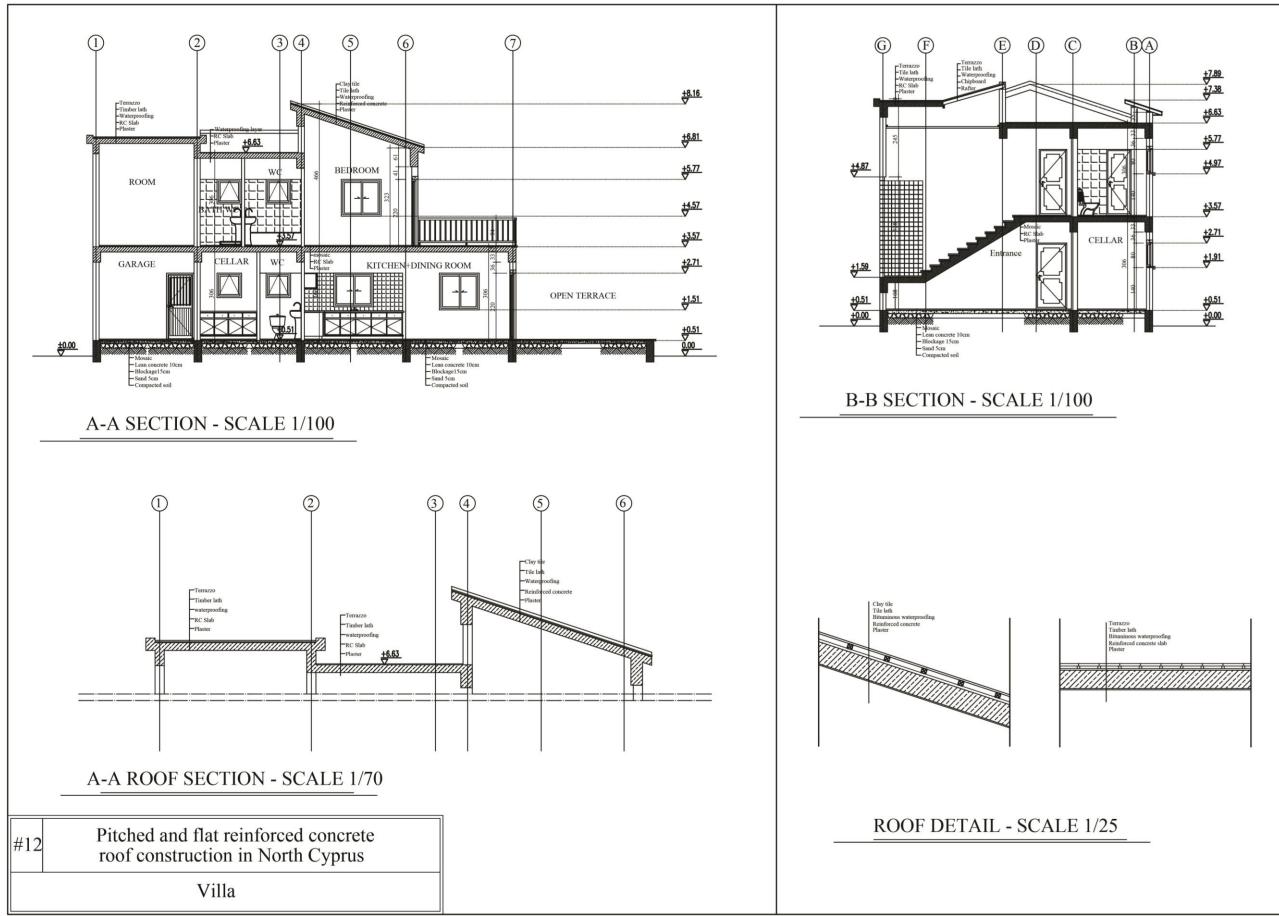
Inclined and flat reinforced concrete roof construction in North Cyprus
